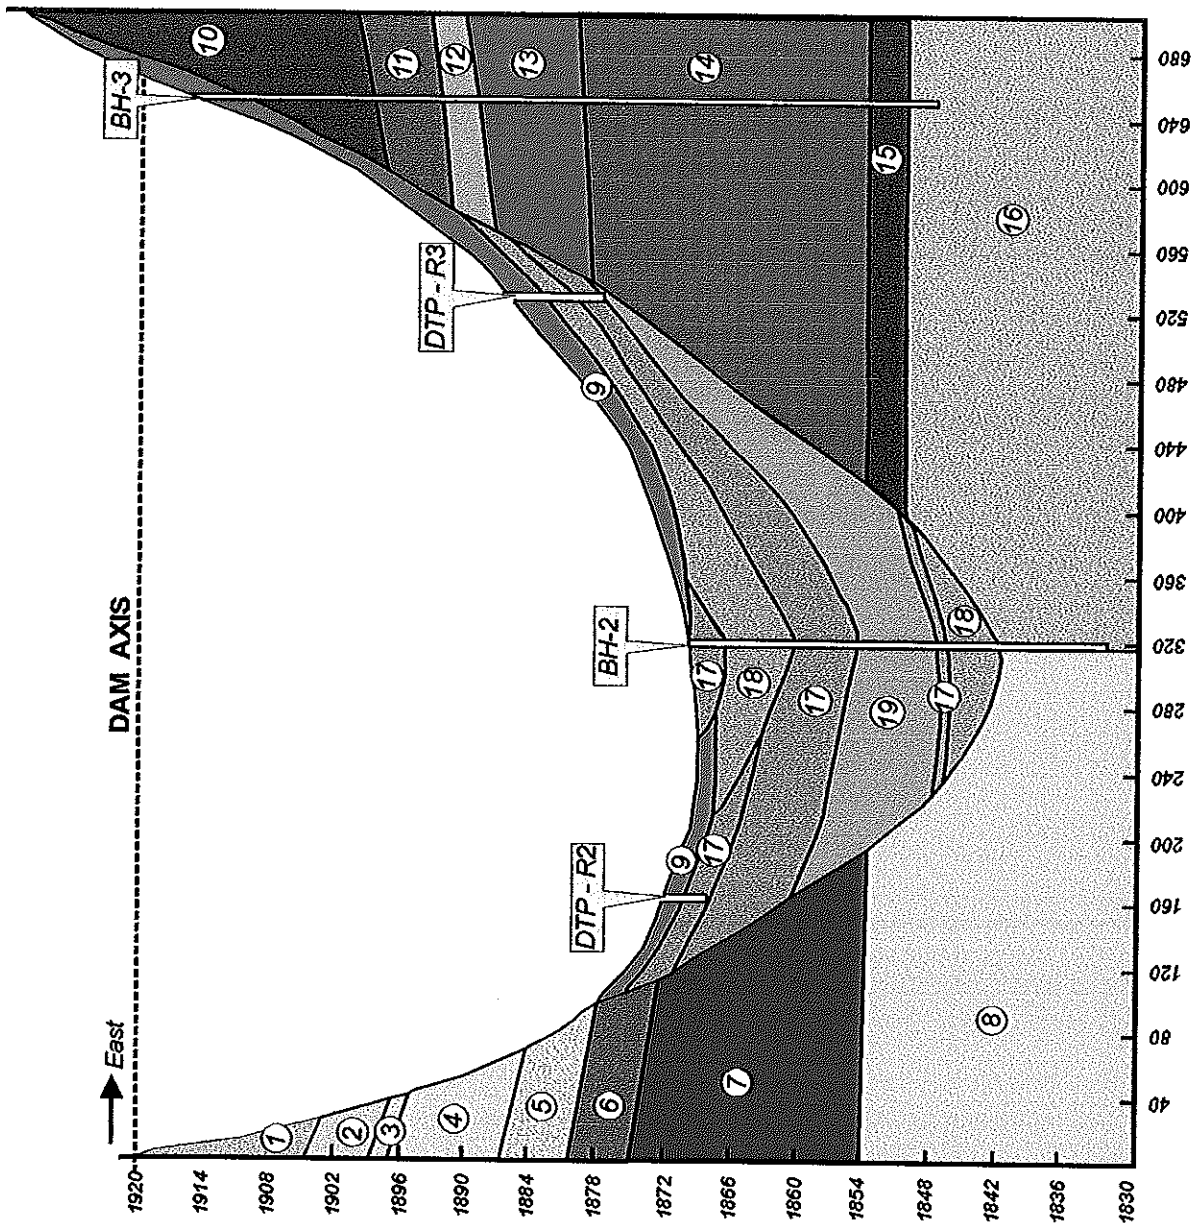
Cross section at Dam Axis showing permeability of the foundation material.
